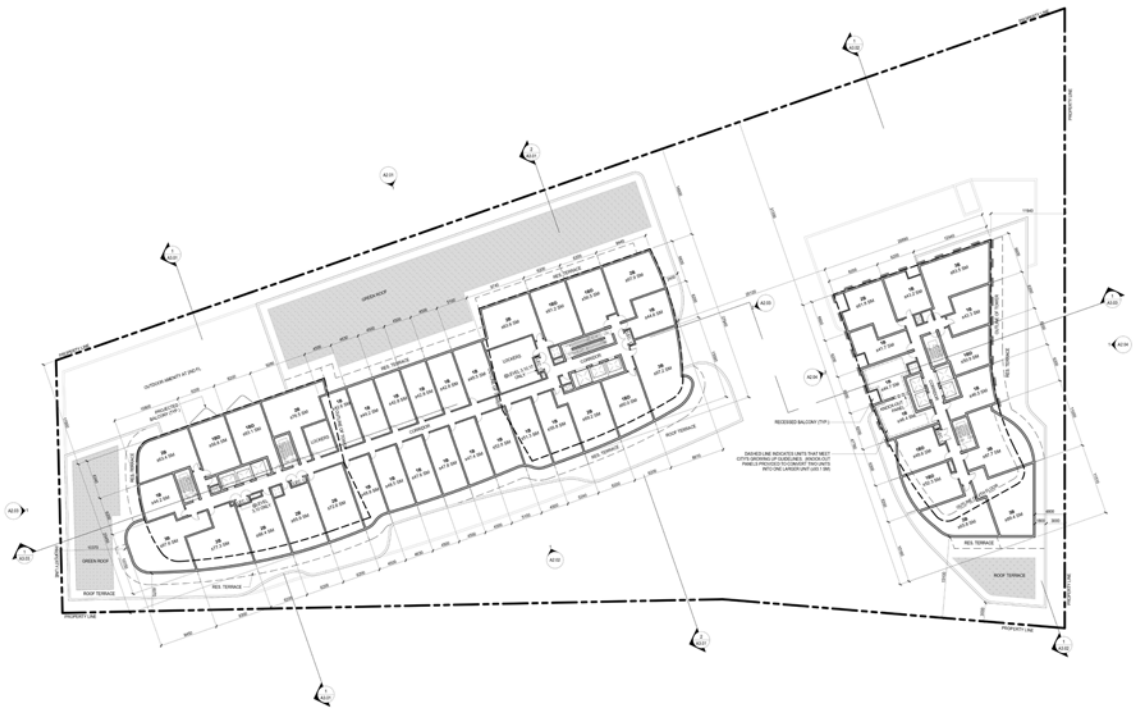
Third Floor Plan (Prepared by Giannone Petricone Associates Architects)
